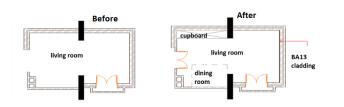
Second configuration: cupboard and dining room layout. (Source: Authors, 2023)
